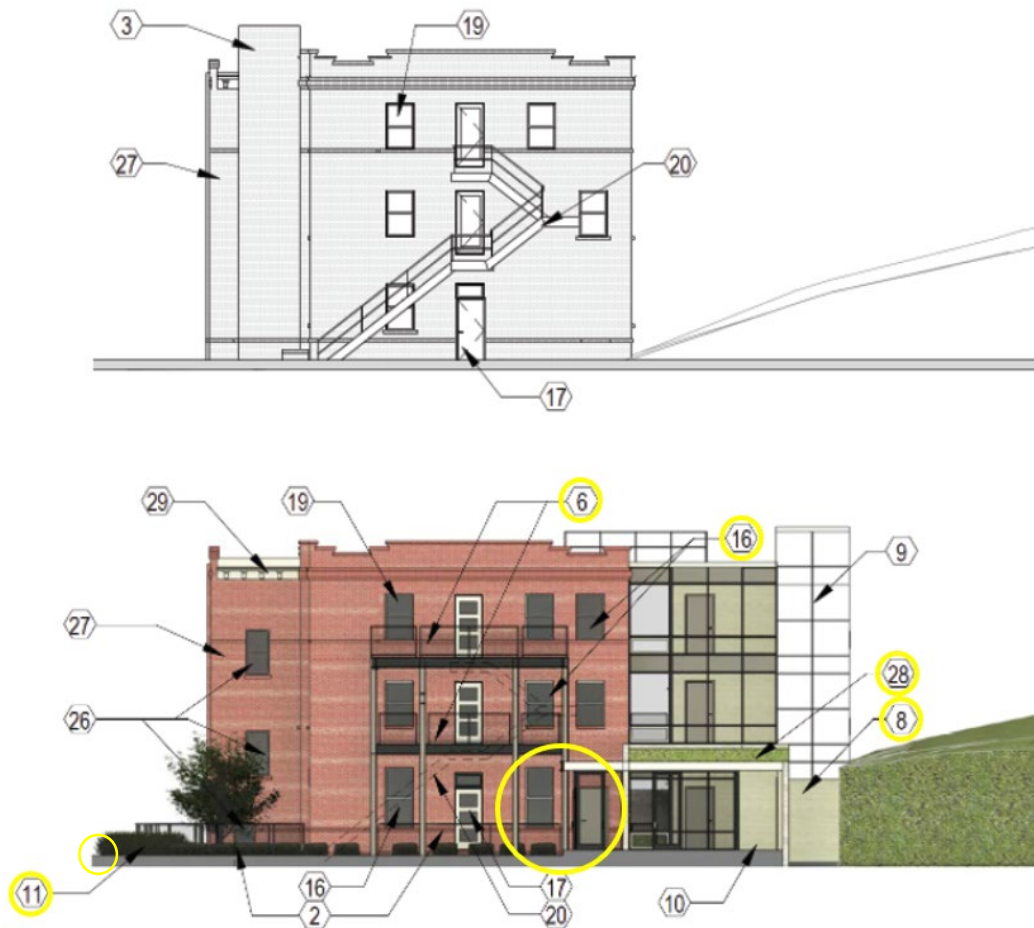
Existing (top) and proposed west elevation of 2543 4th St. Numbers noted in narrative highlighted. New window and door opening indicated by staff.
